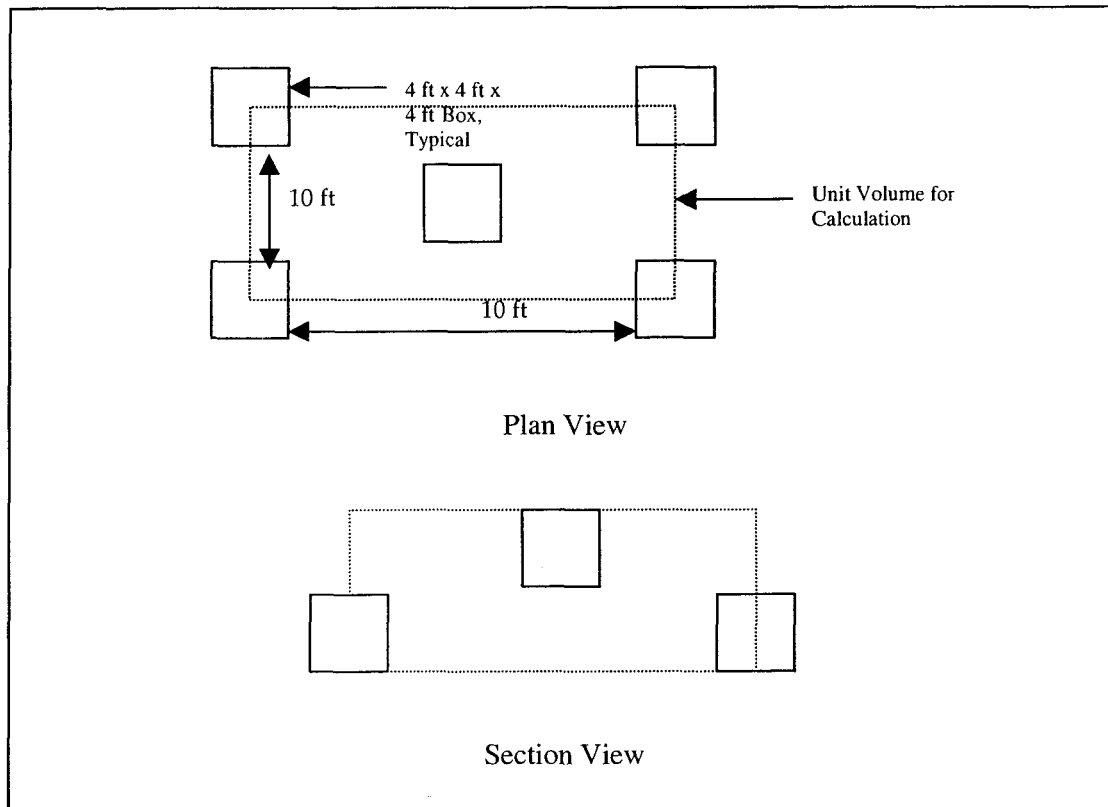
Plan and section views for 4 ft × 4 ft × 4 ft boxes.
